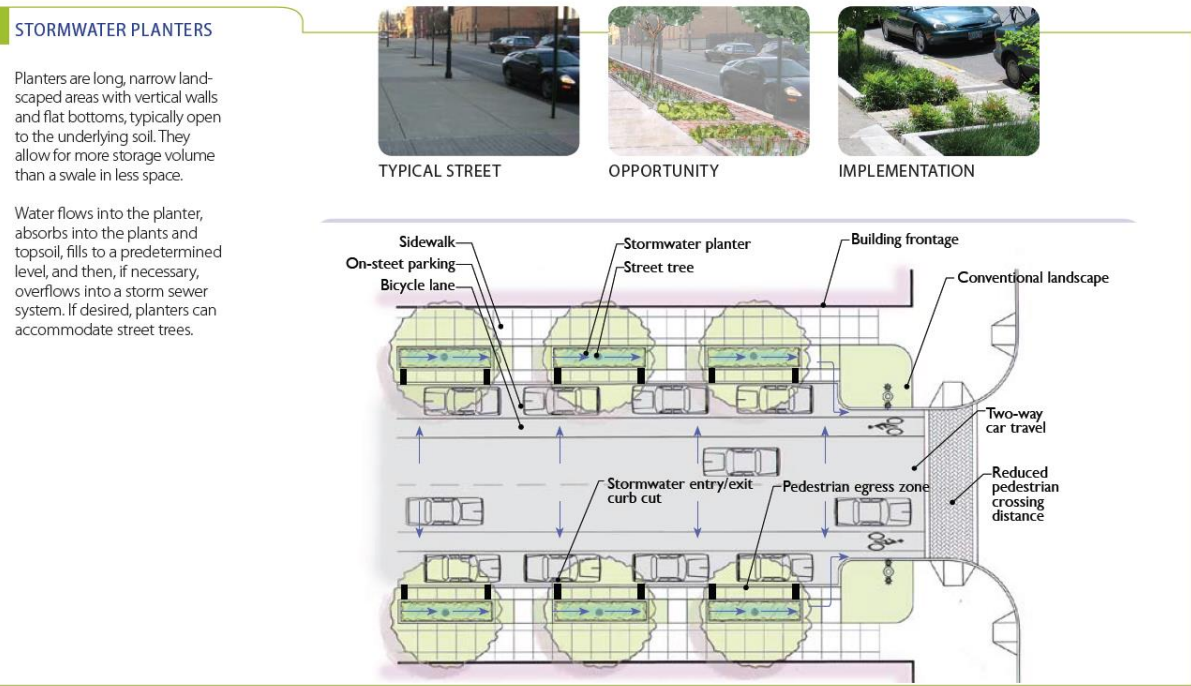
Green Streets with Stormwater Planters (EPA, 2009)
